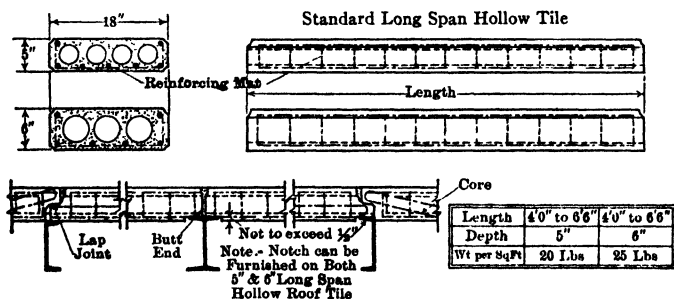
Details of Long Span Pyrobar Precast Roof-Tile
